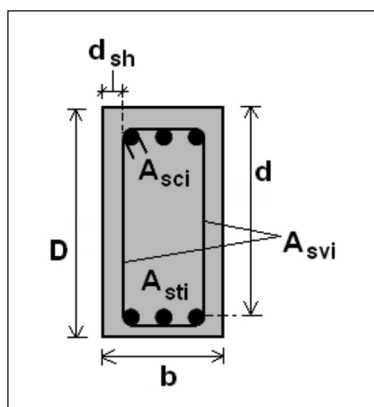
Typical cross-section of an un-corroded RC beam
